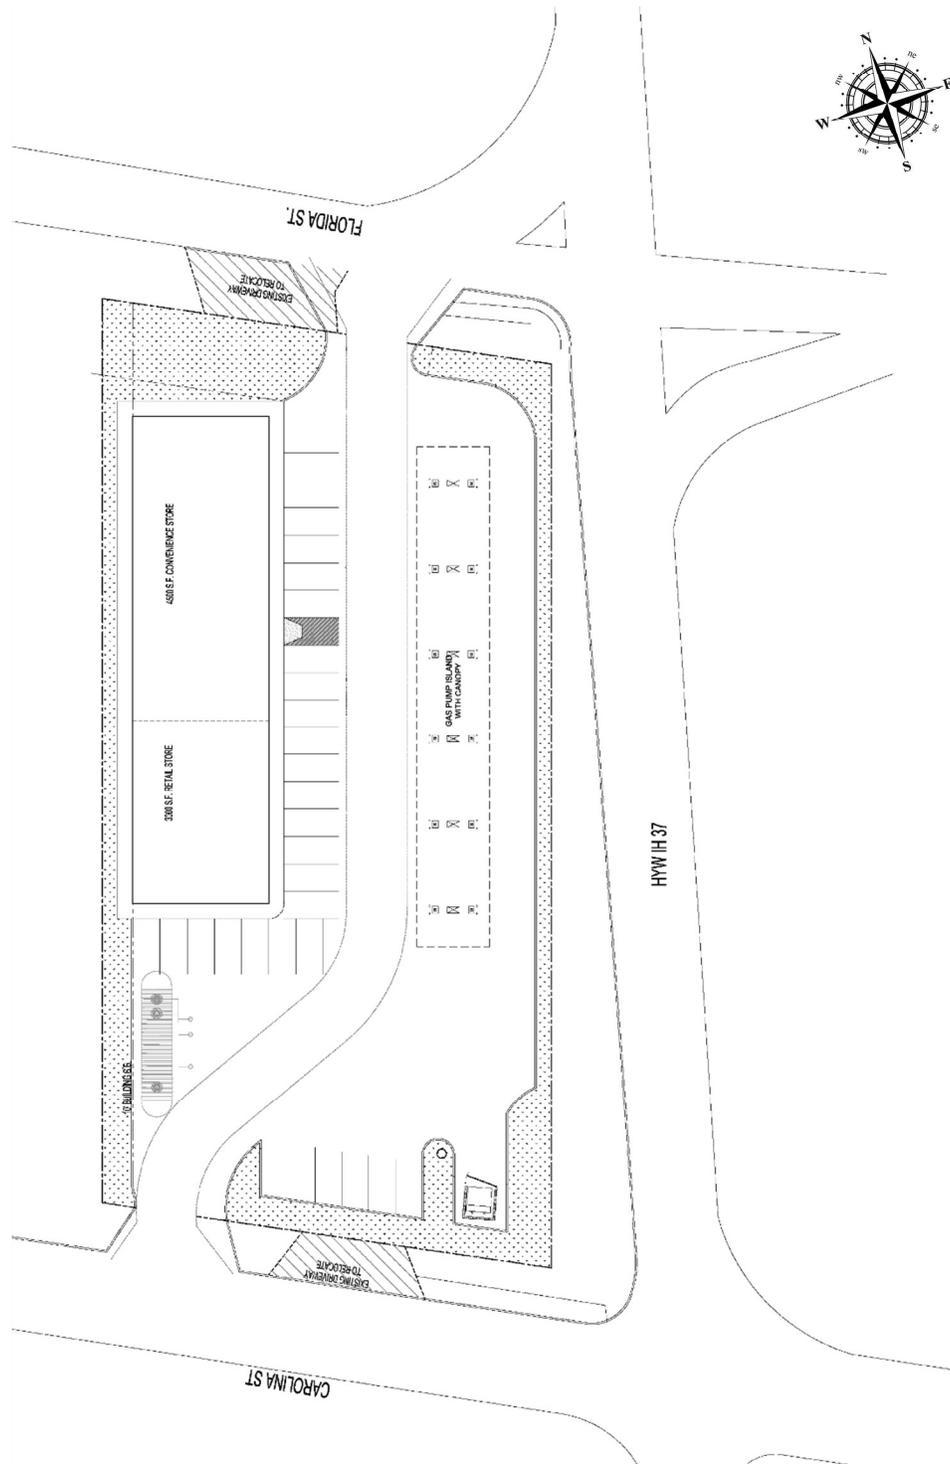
Site Plan for the Proposed 418 Florida Convenience Store
